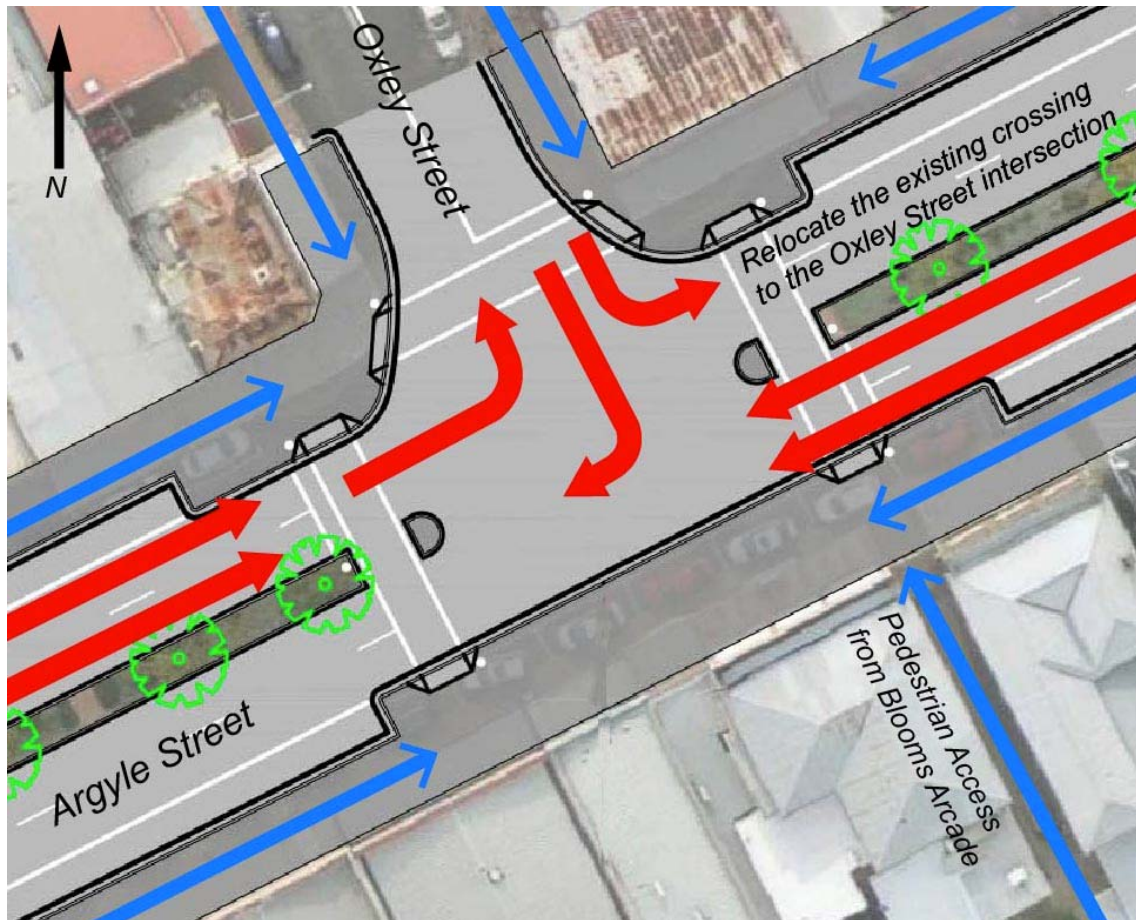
Proposed signalised intersection corner Argyle Street and Oxley Street
